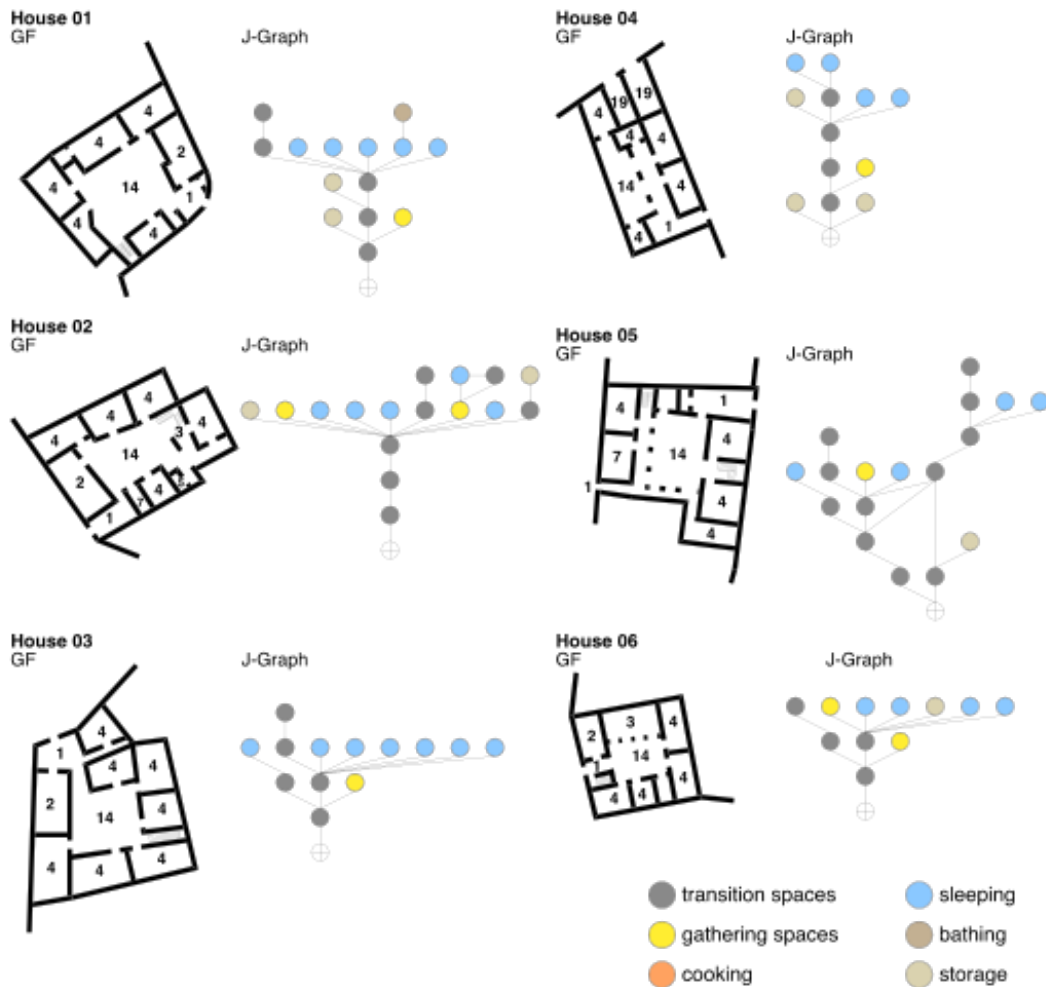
Plans and J-Graphs of Traditional Bahraini Commoners houses. Source: Waly, 1992. 1.entrance/ vestibule; 2.majlis/reception quarters; 3.liwan/portico hall; 4.room; 5.hamman/bath; 6.kitchen/cookery/coffee burner; 7.storage; 8.door keeper; 9.men's room; 10.visitors room; 11.living room; 12.servants room; 13. animals; 14.courtyard/reception courtyard; 15.family courtyard; 16.married son courtyard; 17.servants/animals courtyard; 18.private courtyard; 19.shop; 20. open roof.
